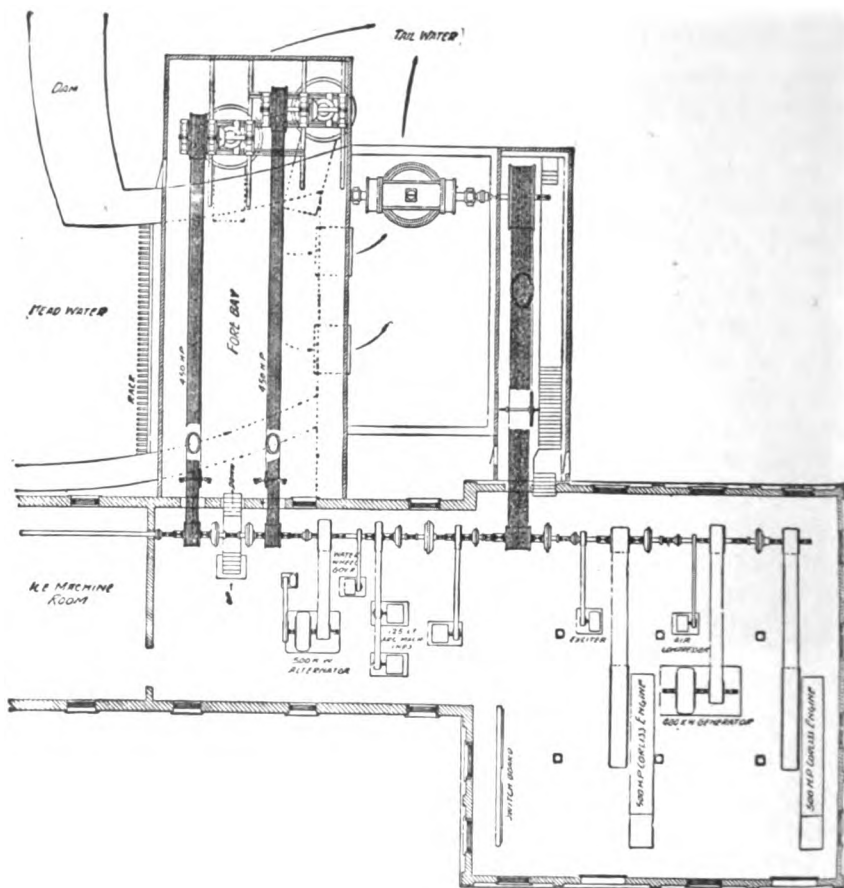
Plan Showing Harness, Rope Drive and Jackshaft. Southwest Missouri Light Co.
